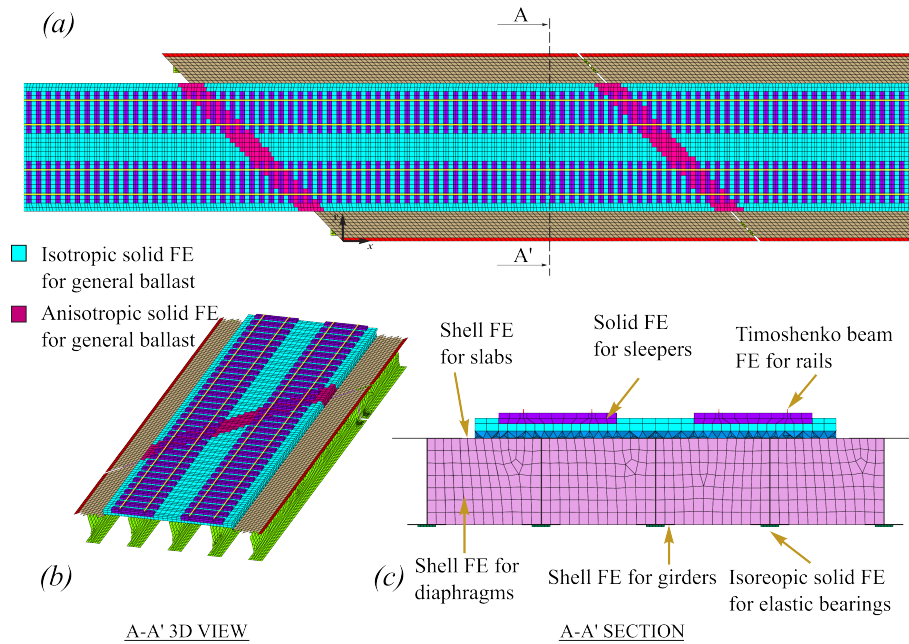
3D track-bridge FE model. In the view: (a) plan view of half bridge and track extension; (b) 3D detail of deck section; and (c) AA' cross section.
